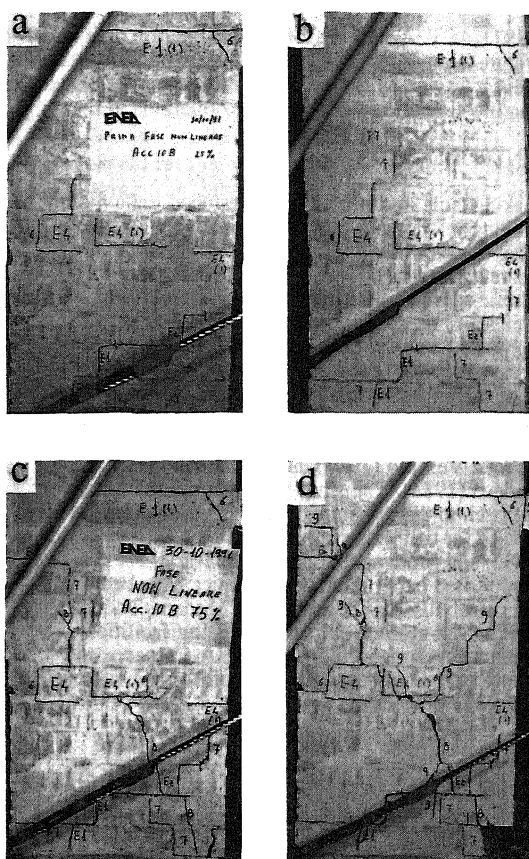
Typical crack pattern evolution on one of the base walls of the model.
